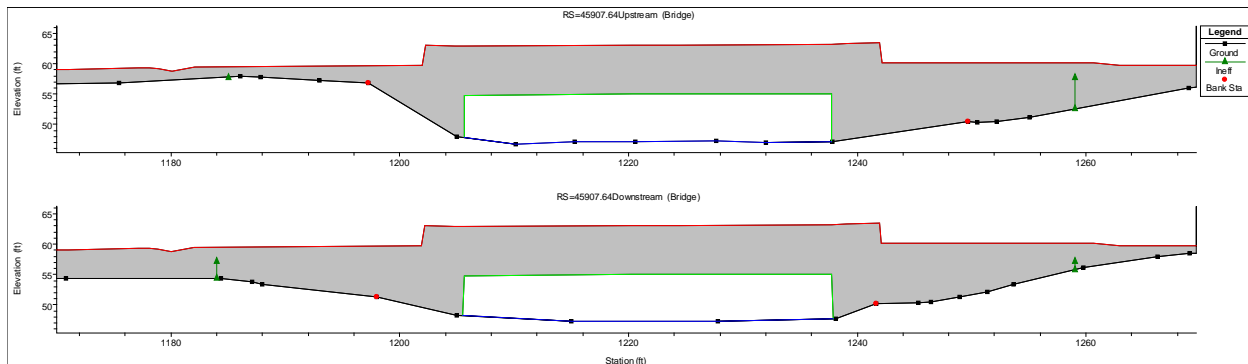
Cross Section of East Grove Street Bridge in Corrected Effective Model
